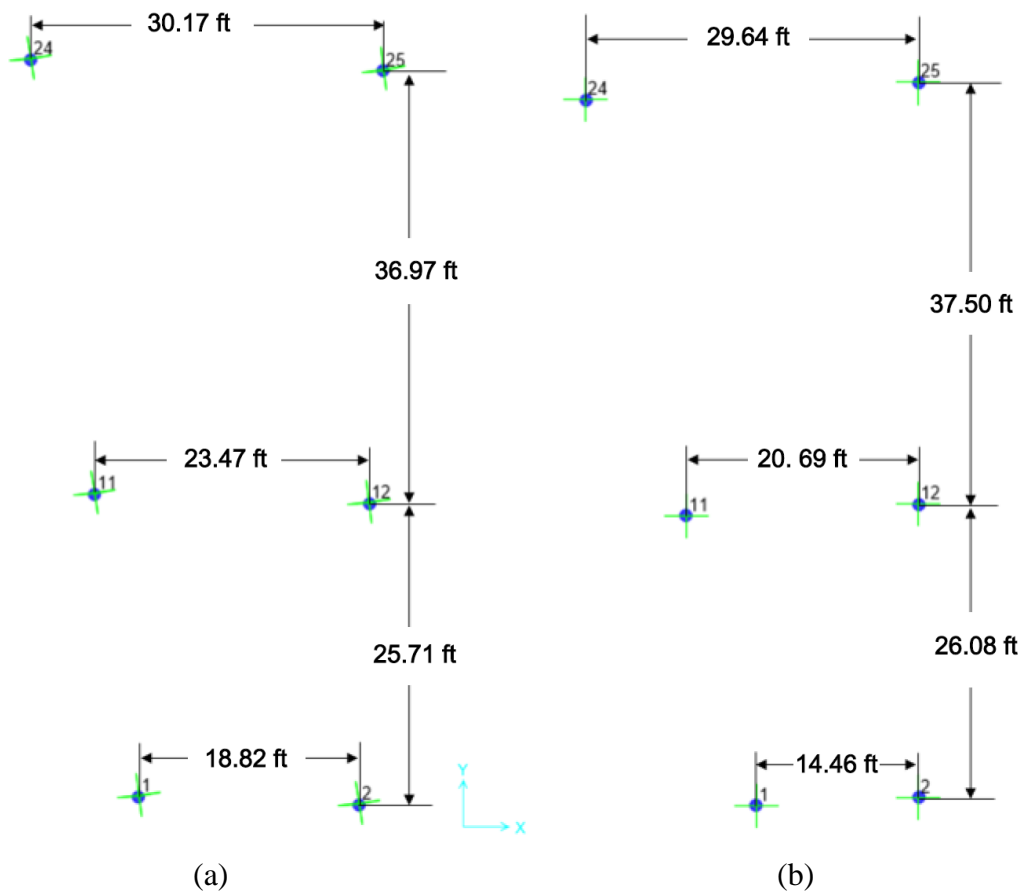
Plan view base dimensions: (a) Original point cloud; (b) Structural plans
